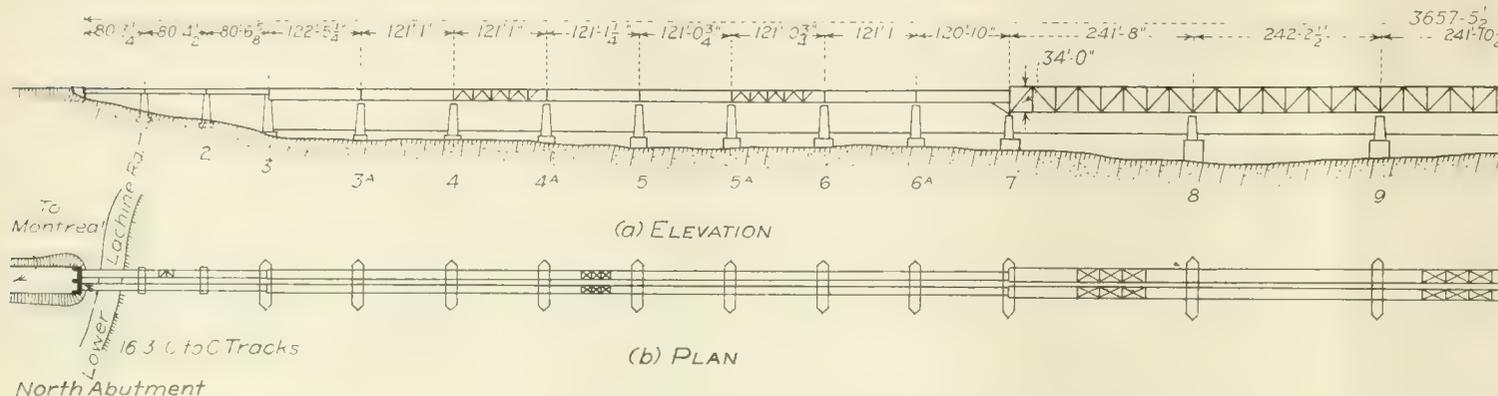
Elevation and Plan of St. Lawrence River Bridge Near Montreal, Can.,
